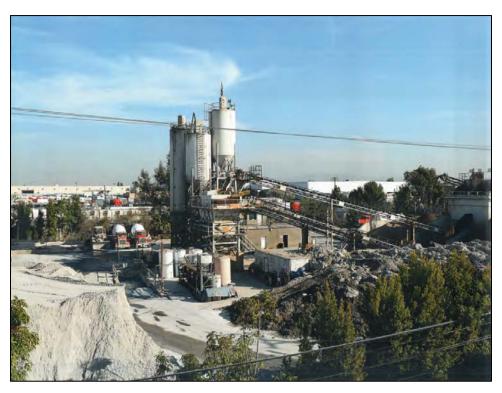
PHOTOGRAPHS OF PROJECT SITE
